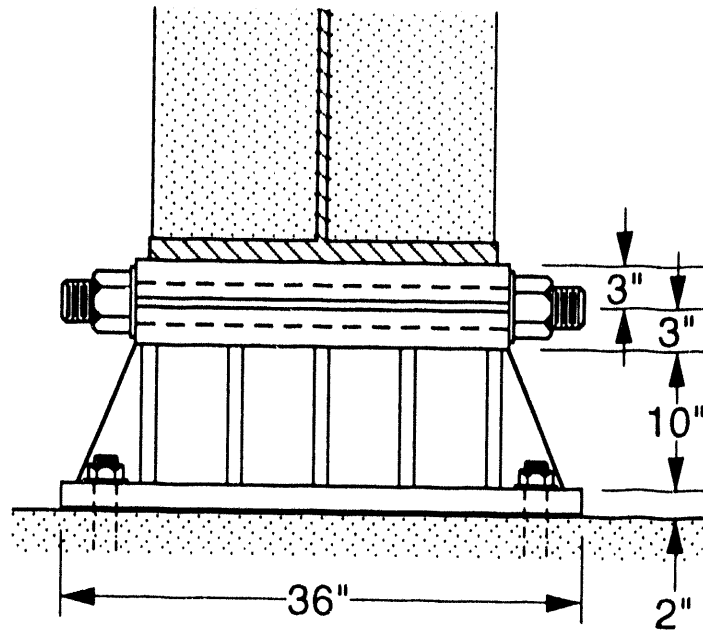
Connection detail found at pier 2 that constrains longitudinal displacement.
